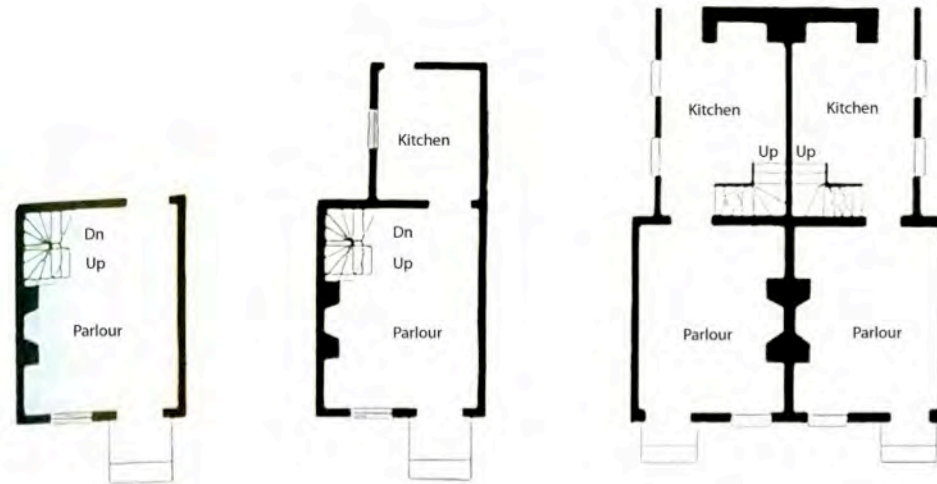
Typical first floor plans of two bay wide and one room deep alley houses and a kitchen added to the rear of the house. (Sketch courtesy Ridhima Mehrotra)
